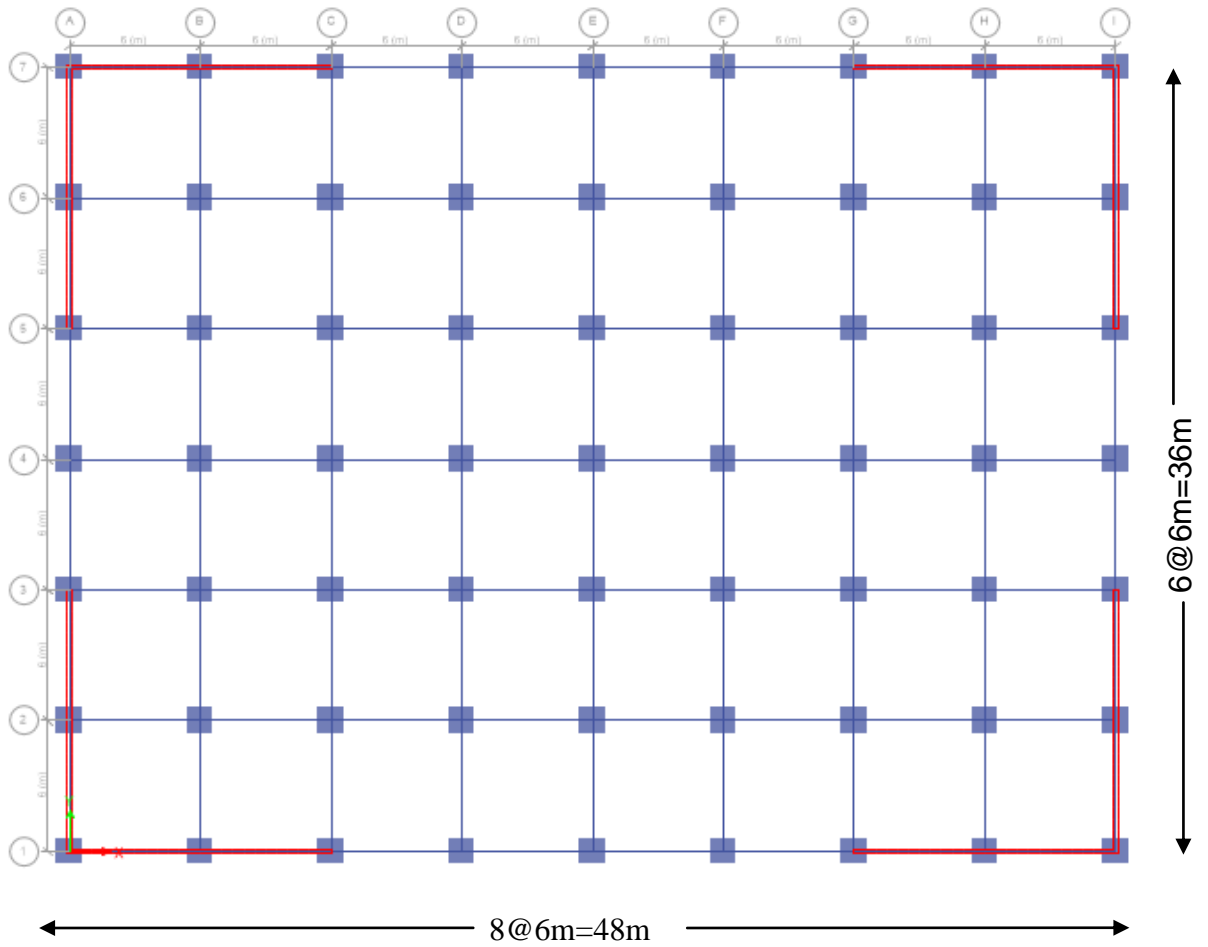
location of bracings and shear wall, when provided in a double bay
